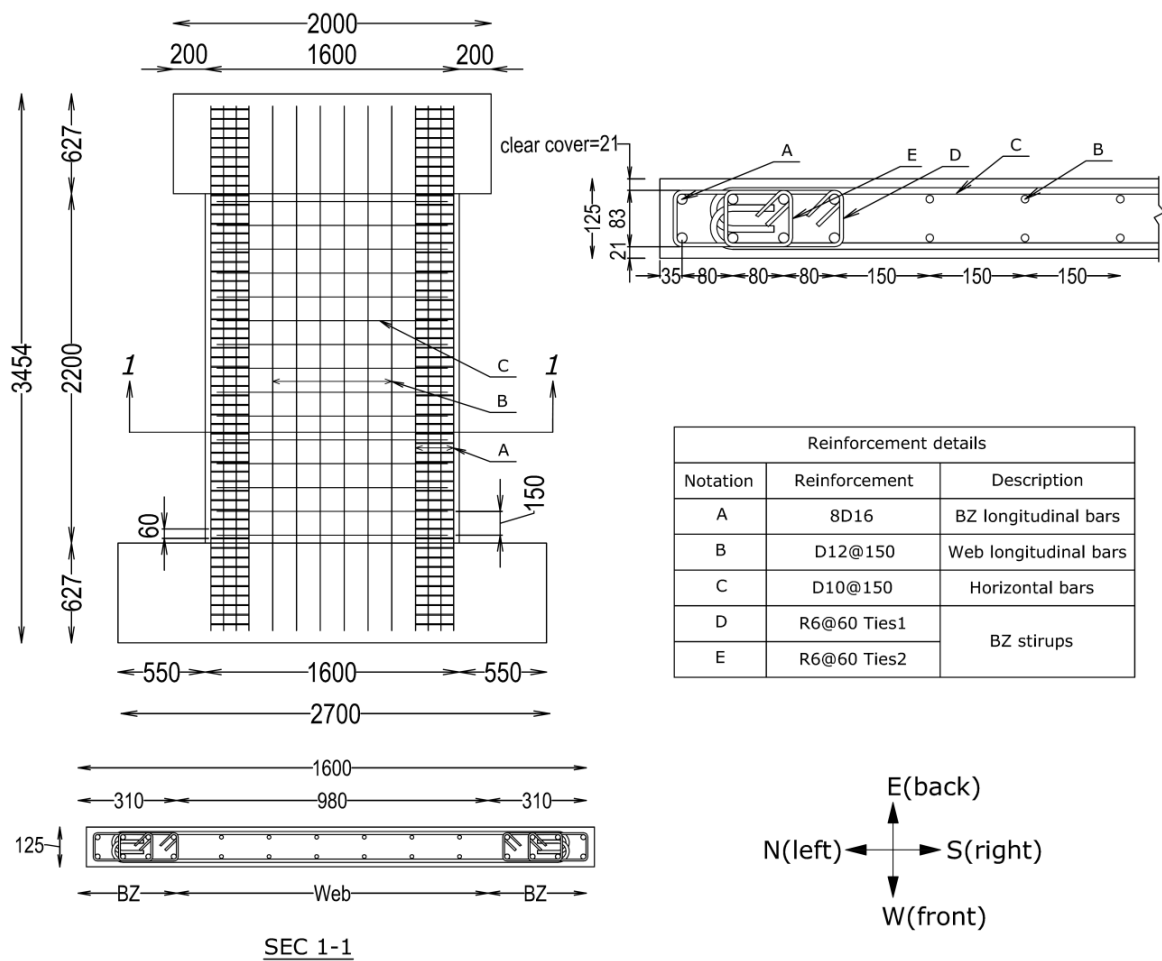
Details of the section and side view of the reinforcement layouts of the specimens
